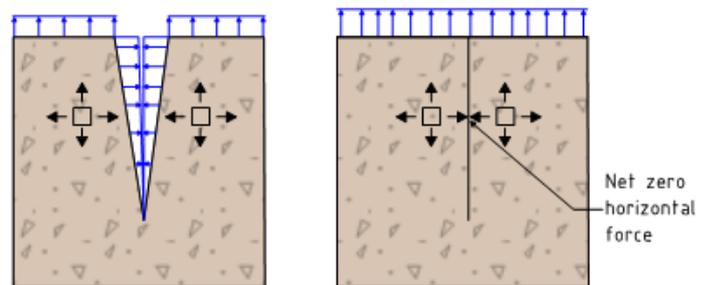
a) Soil swelling within the cracked zone, fills the cracks horizontally and causes vertical ground movement b) Cracked is closed (or below cracked zone) ground movement is only in the vertical direction.
